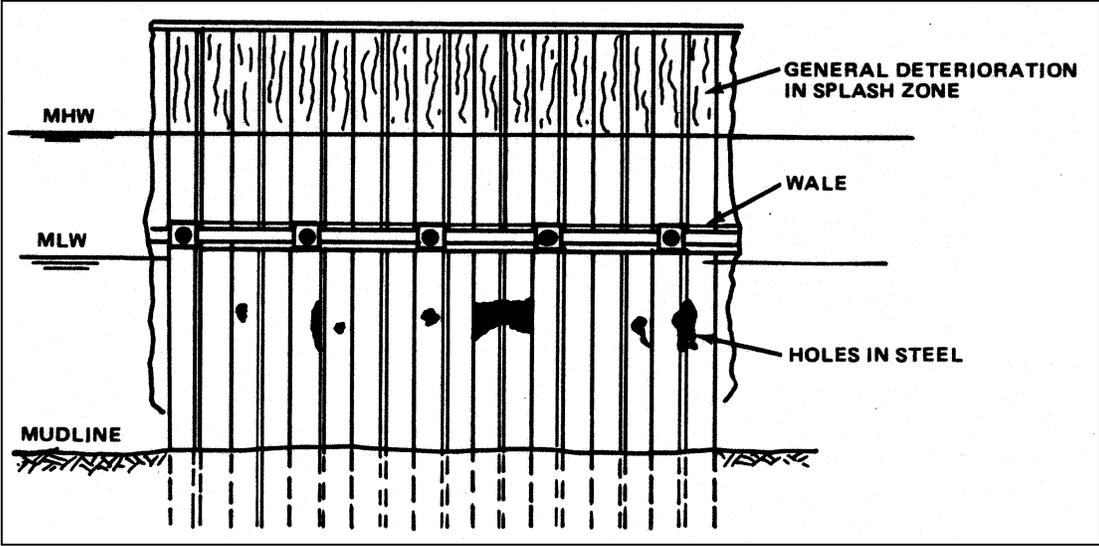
Typical Corrosion on Steel Sheet Piling.
